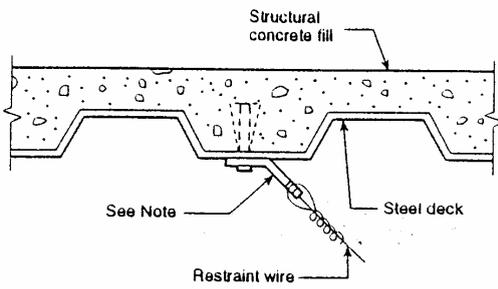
(c) Acceptable details — wire connections to steel decking with fill.
